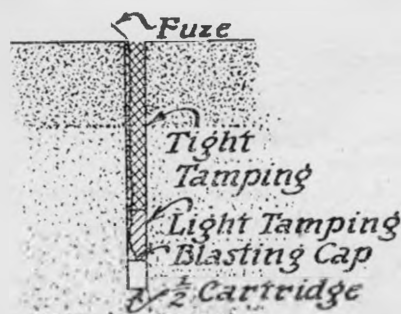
Light tamping immediately over charge to protect cap followed by heavy tamping
